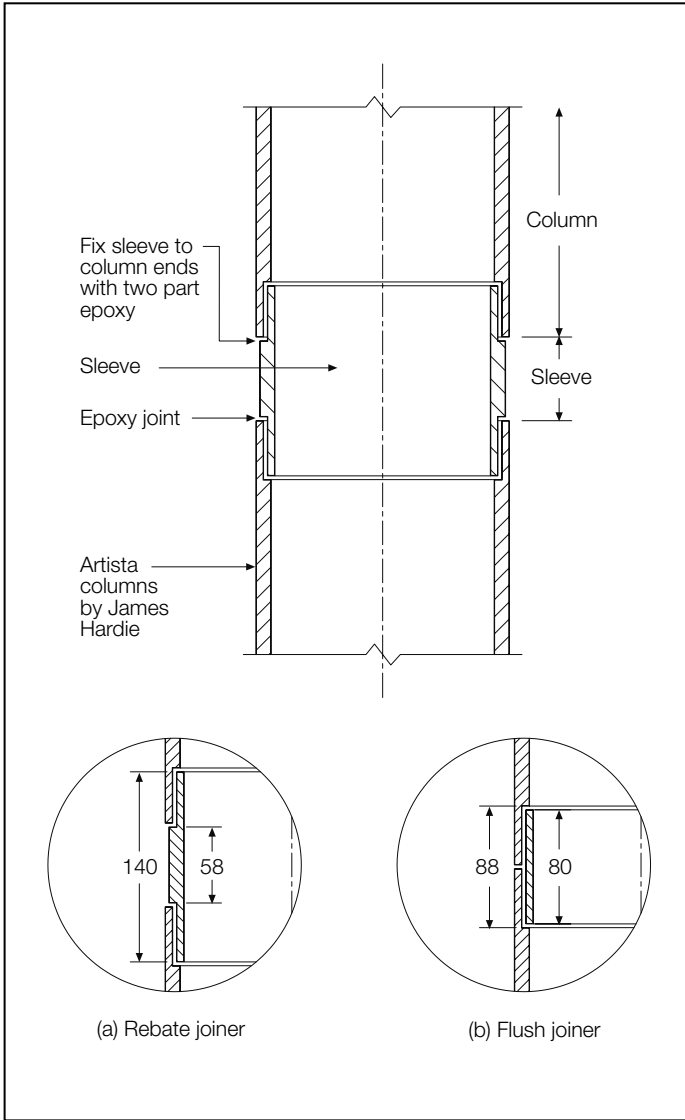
JOINERS FOR JAMES HARDIE ARTISTA CLASSIC COLUMNS
